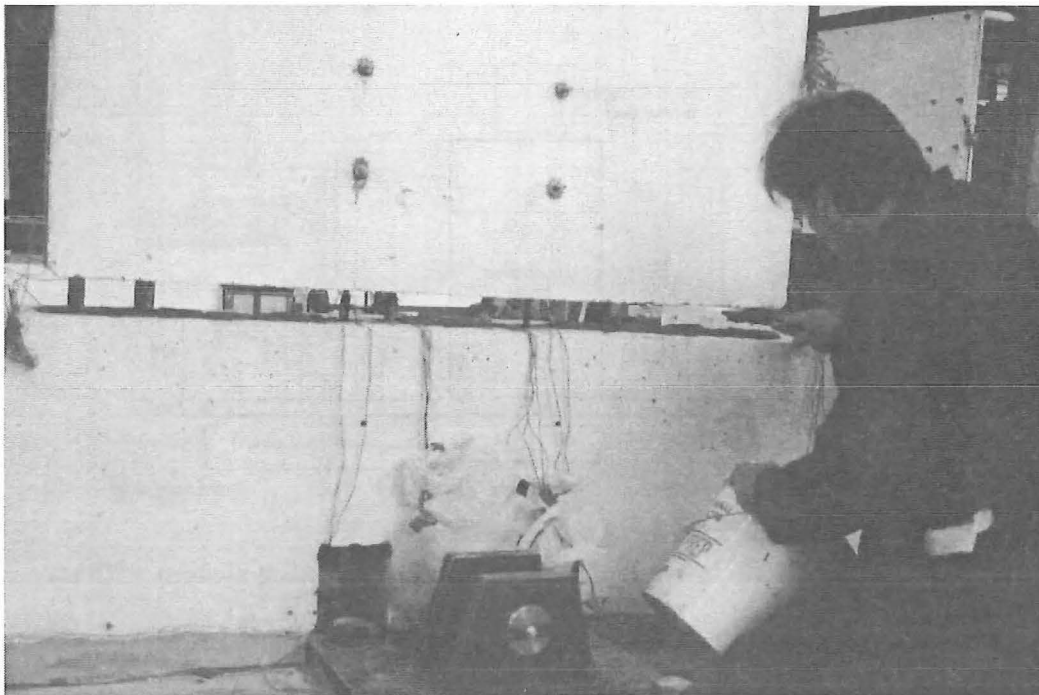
Placing of mortar bed at the wall-foundation beam joint after alignment of wall.
